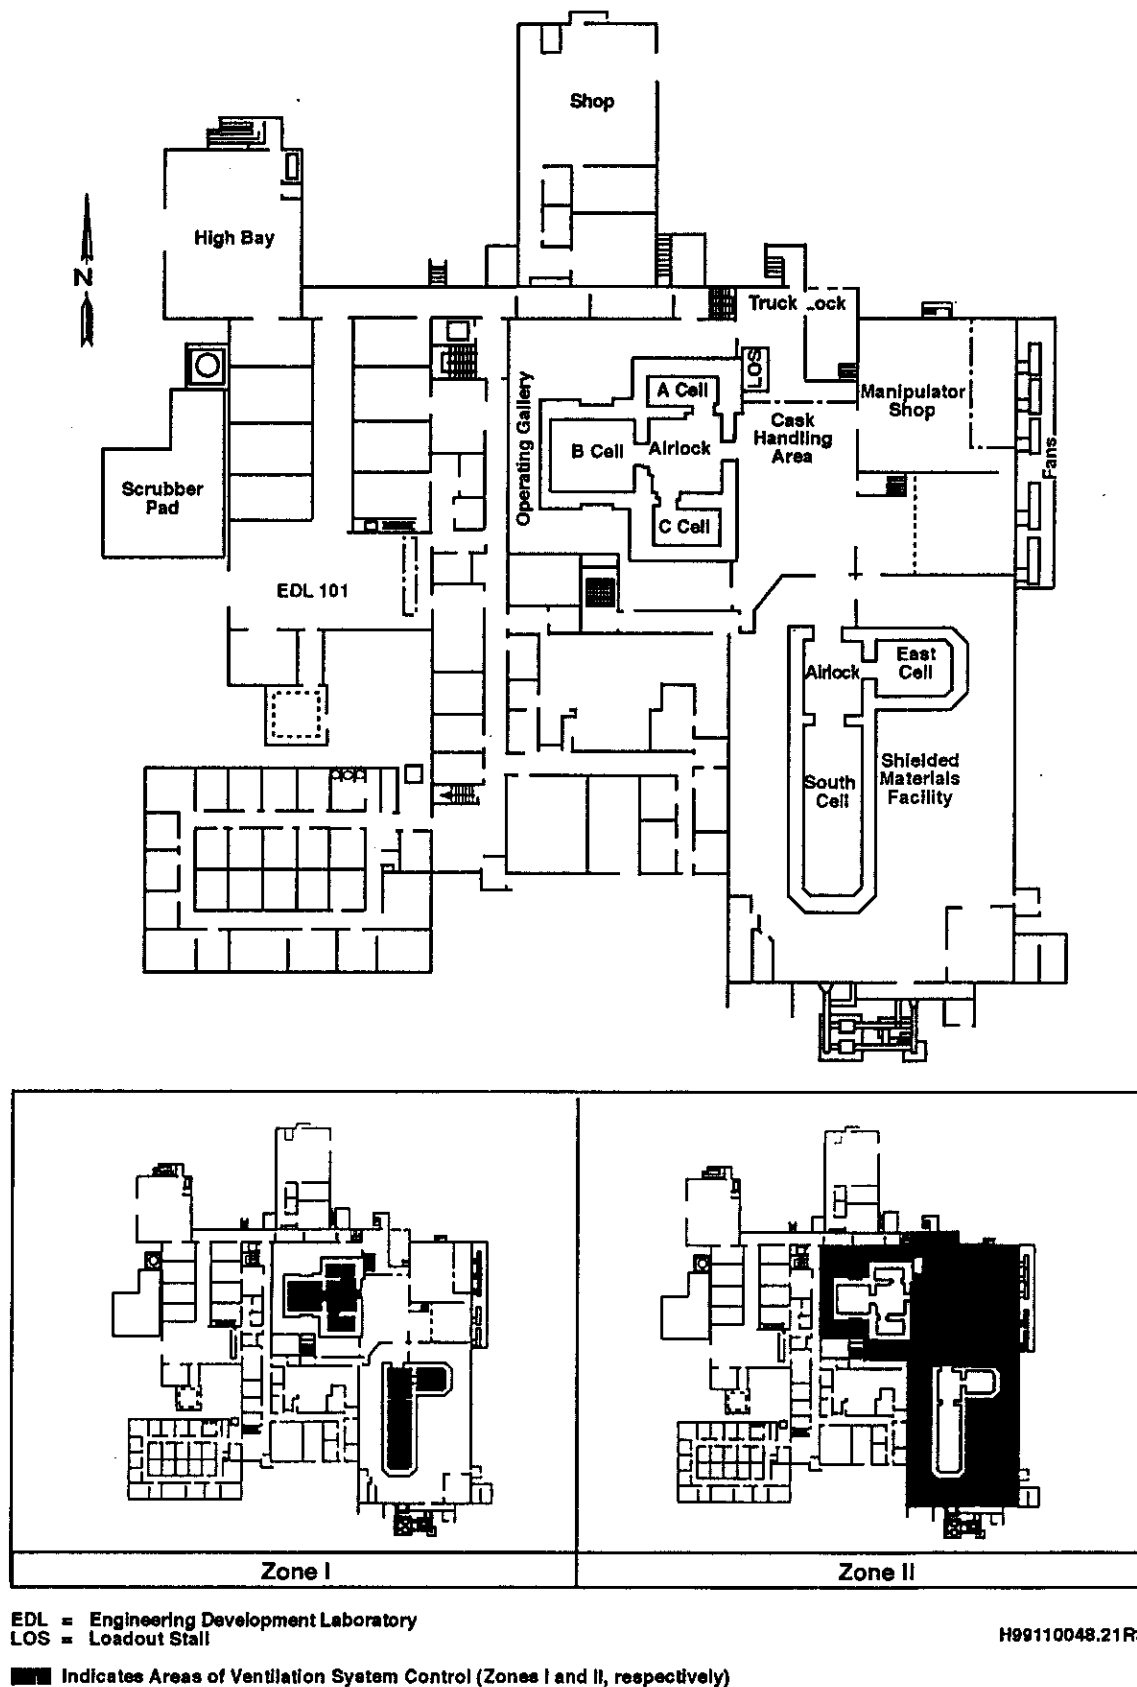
324 Building Floor Plans (1<sup>st</sup> Floor).
